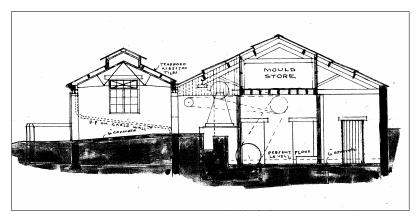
Building Y. Section through the elevation onto Prince's Drive. To the left lies the Clay Bin wing.²⁸
